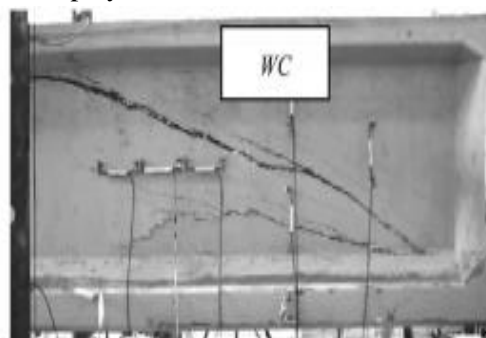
Concrete beam with cracks created in John [4].
